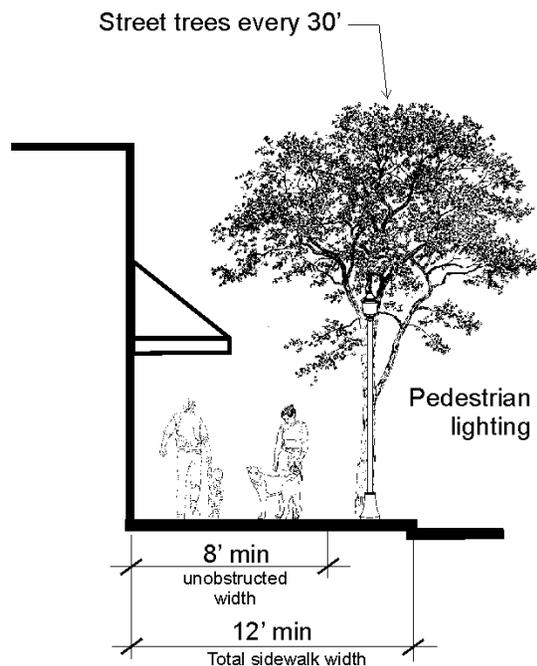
Minimum sidewalk requirements along pedestrian-oriented streets and where adjacent to facades of mixed-use and retail buildings greater than 100 feet in width.
